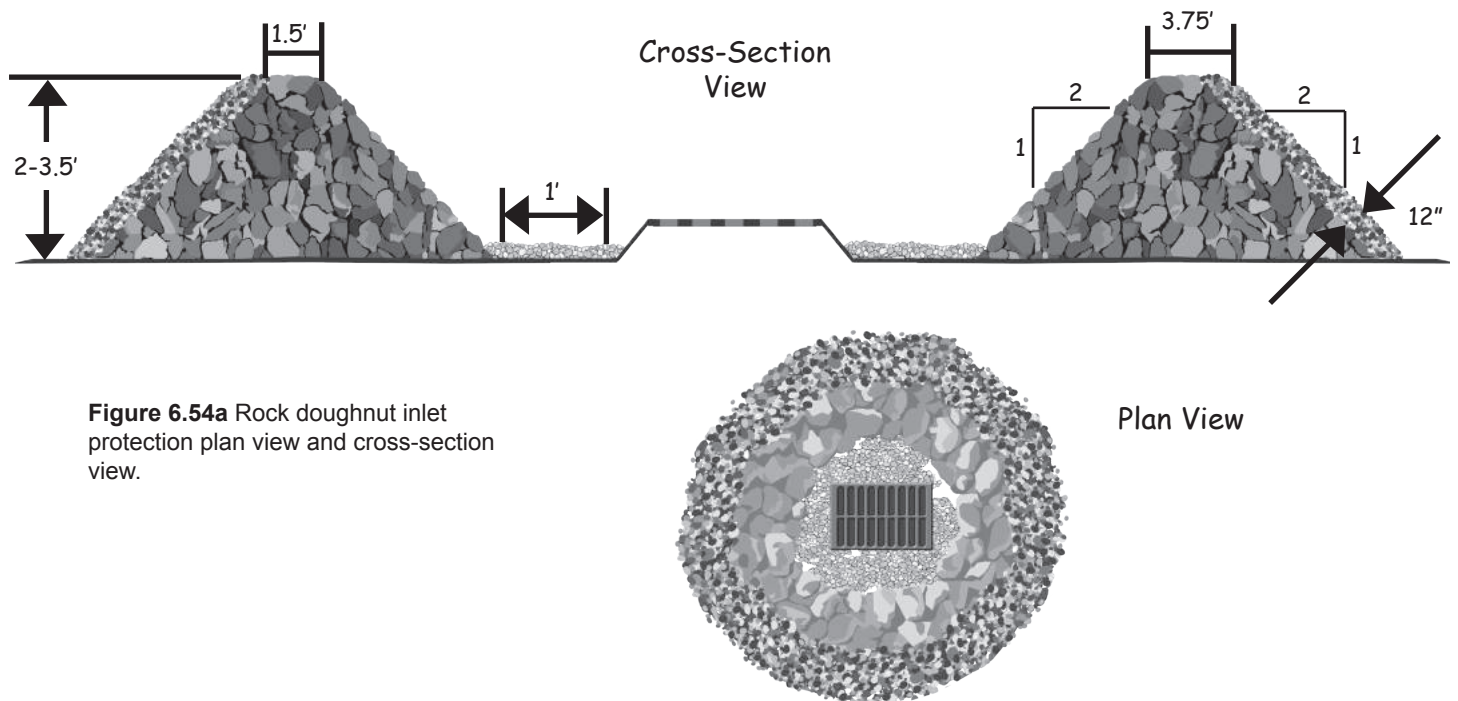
Rock doughnut inlet protection plan view and cross-section view.
